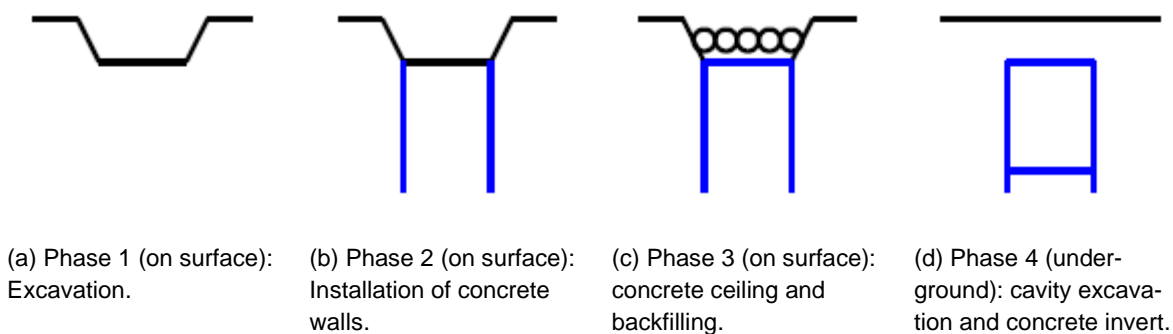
Installation of a tunnel partially from the surface with underground completion.
